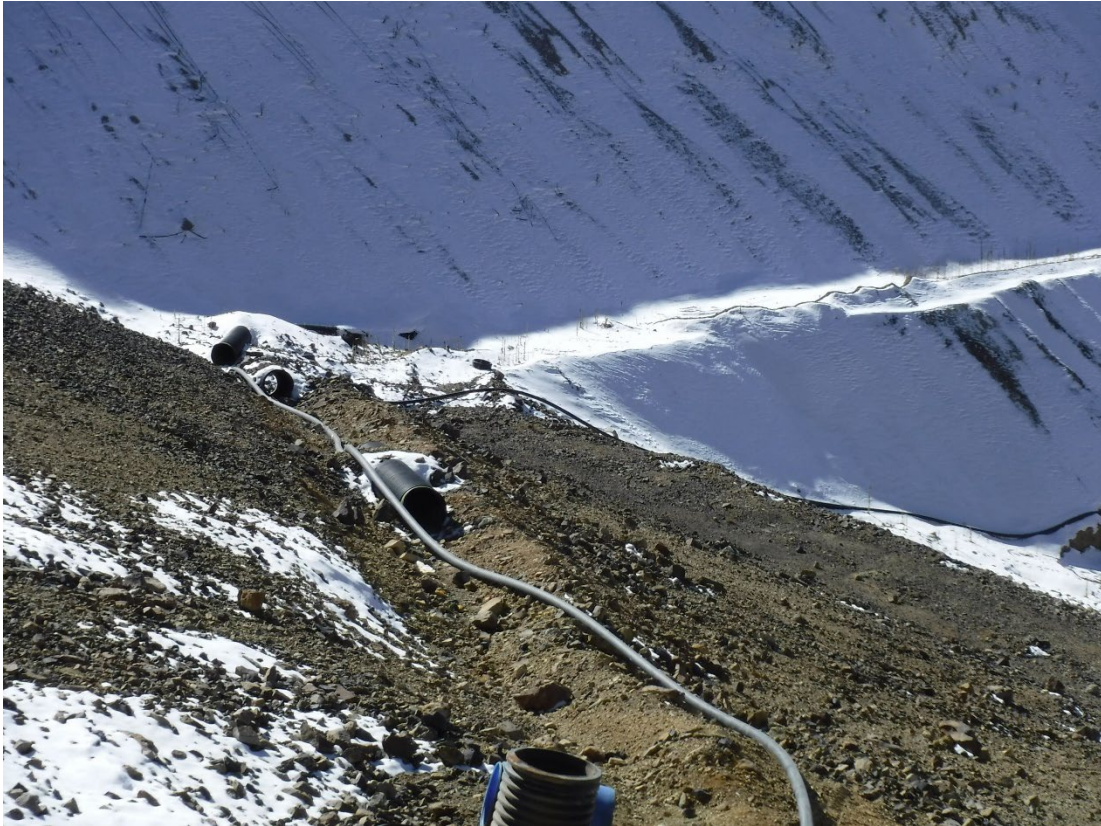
Welded plastic pipe that now conveys water to sump
